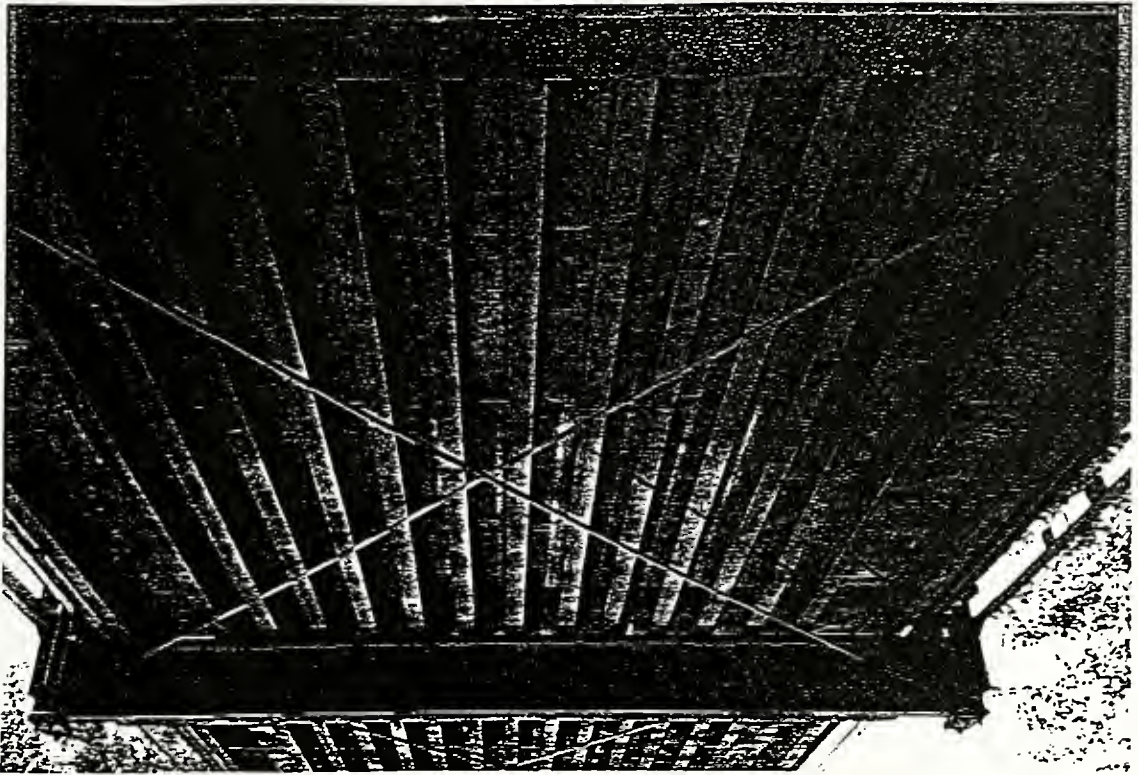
Underside of deck showing stringer and floor beam layout
